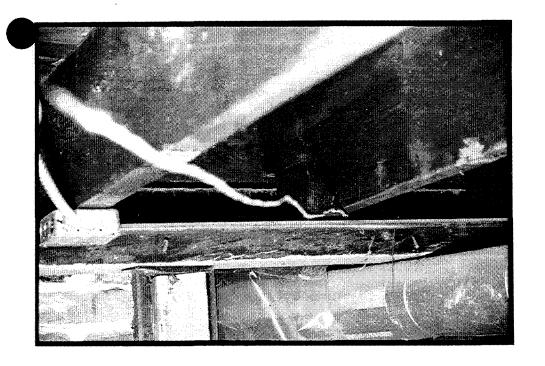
FIRST FLOOR JOISTS AT THE WEST SILL BEAM
